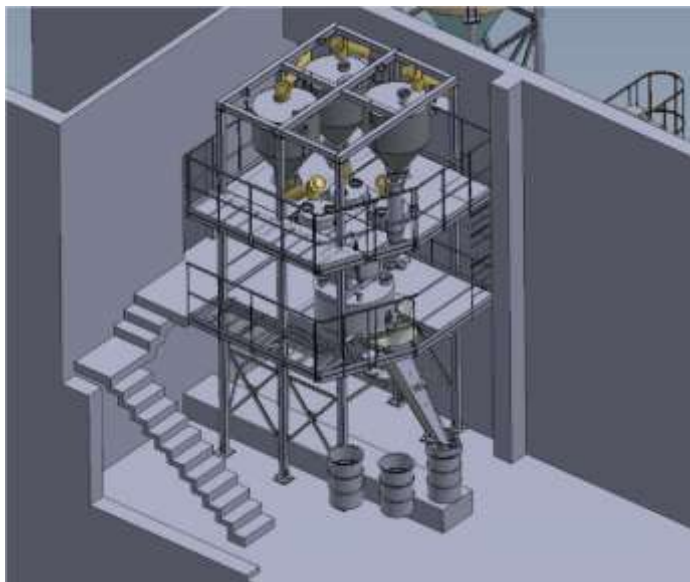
Equipment layout of the cementation facility in the CRWP building
